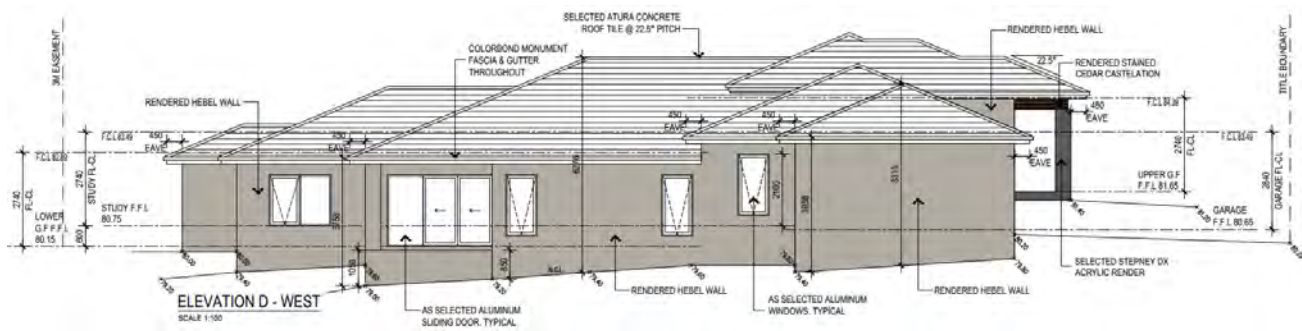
West elevation as it appears towards #7 Tranquil Way (Source: Aliya Homes TP200).
